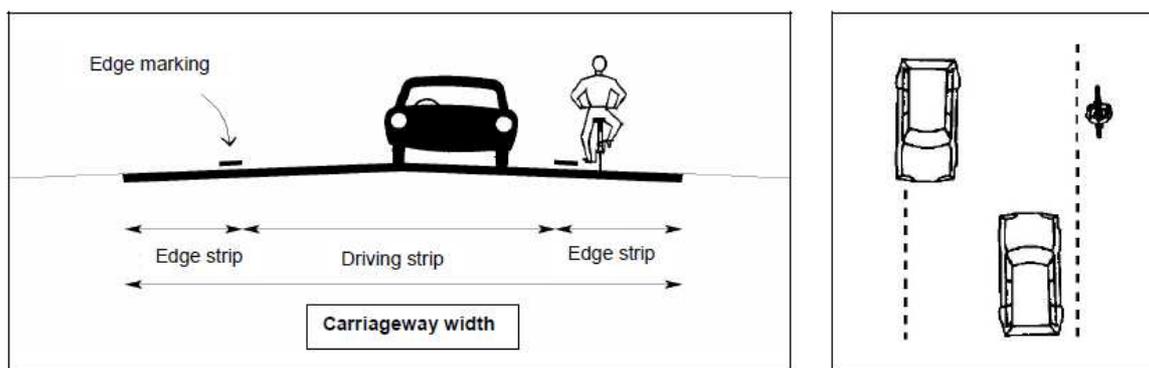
Minor rural access road type I as proposed by the SWOV Institute for Road Safety Research: driving strip with edge strips. Cross section (left) and view from above (right). Source: [9]
